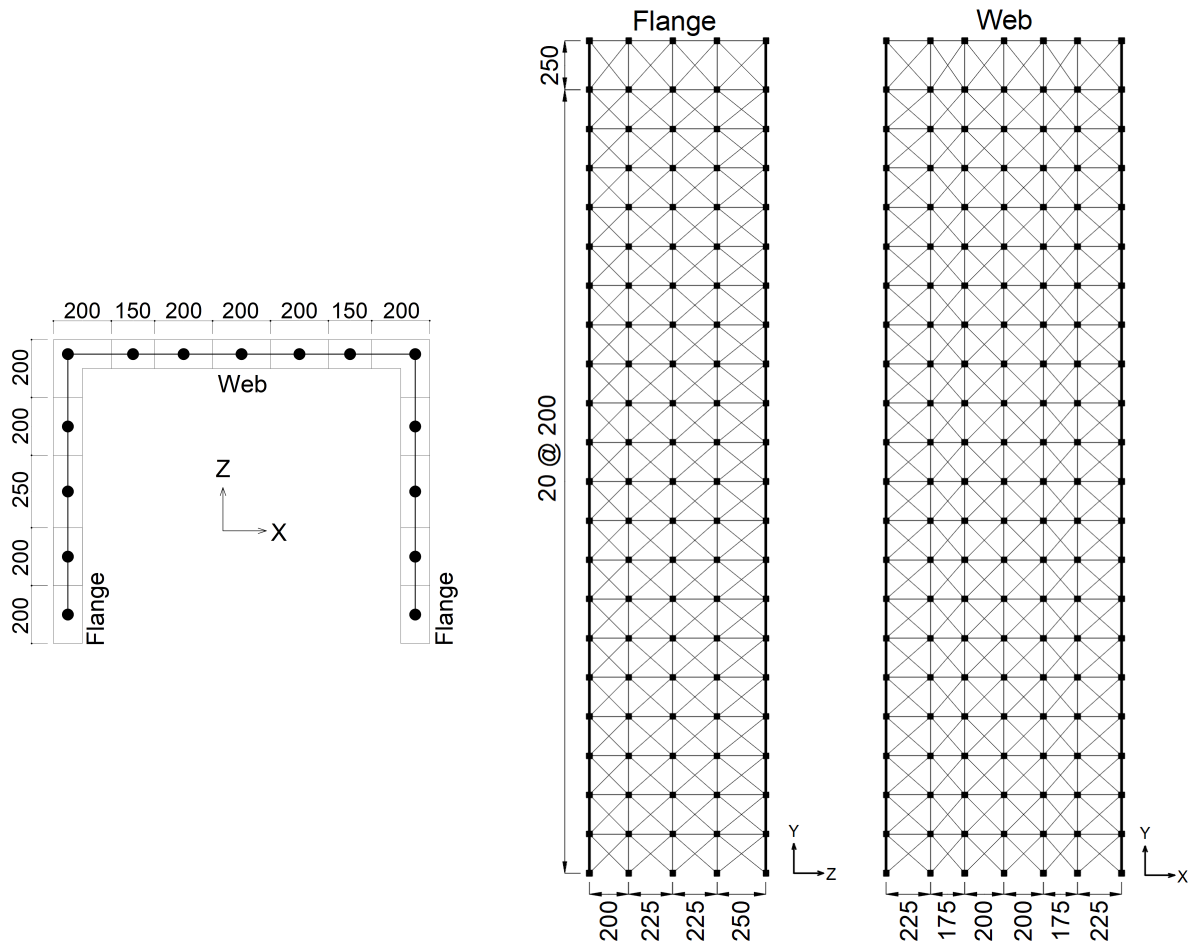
Plan and elevation views of the beam-truss model for TUF [Unit: *mm*].
